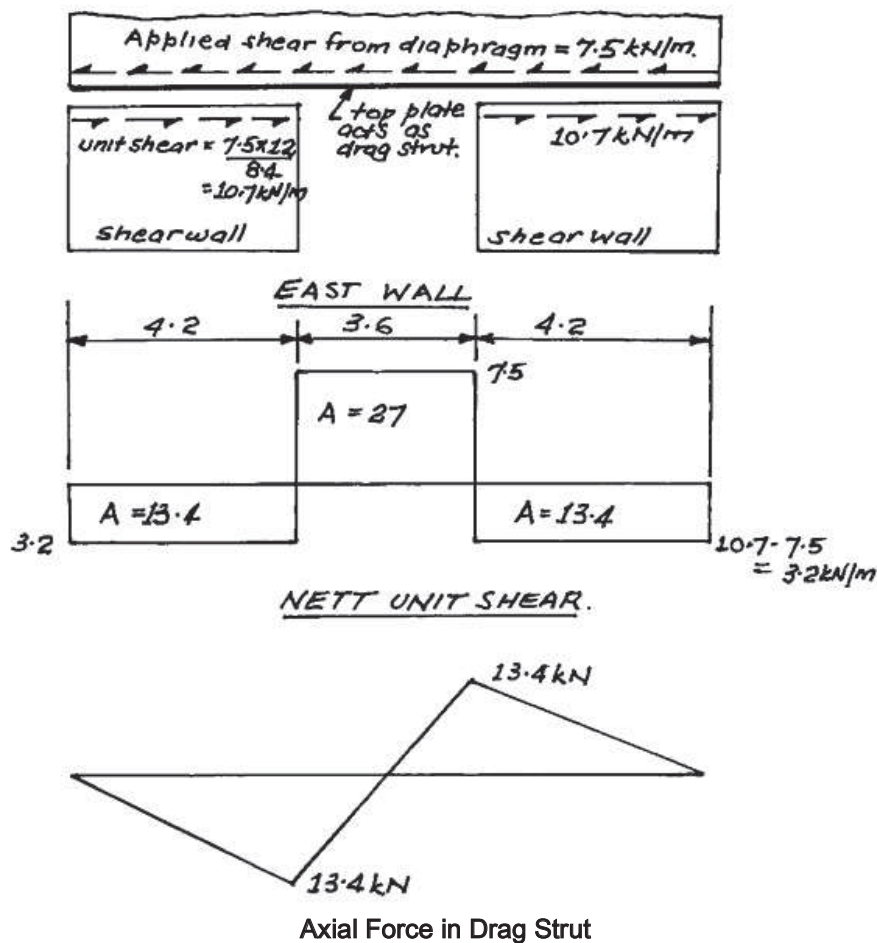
Build-up of axial force in drag strut due to opening
